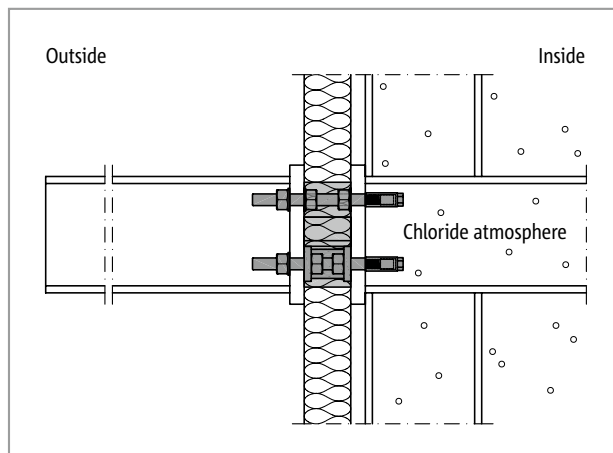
Schöck Isokorb® T type S with protective caps for cantilevered steel structure in an internal atmosphere containing chloride
